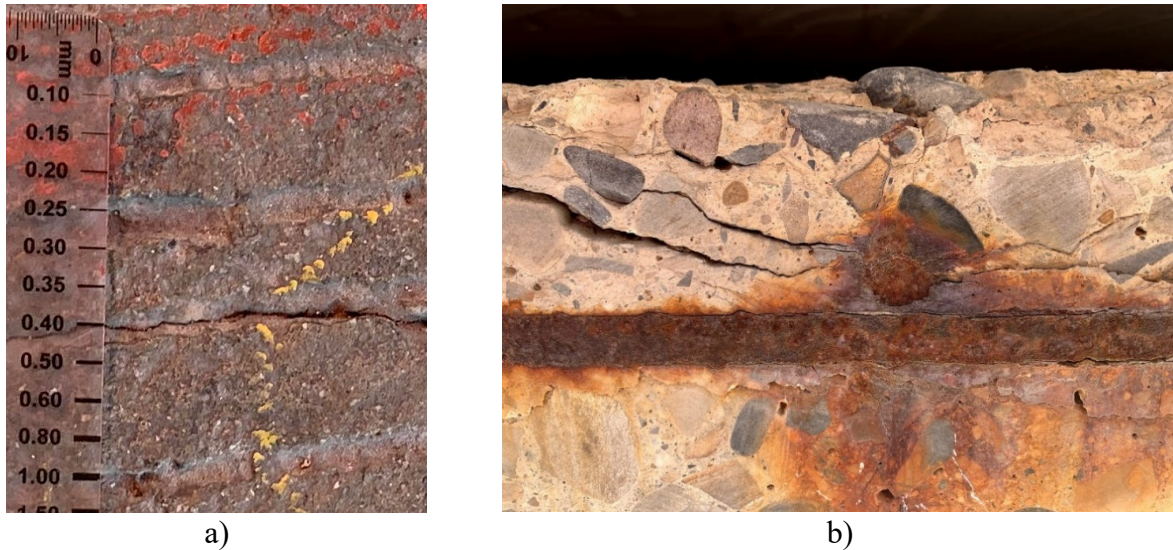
a) Photograph of a vertical crack visible on concrete deck surface and b) a cross-sectional view of damaged concrete cover with notable rebar corrosion beneath the surface.
